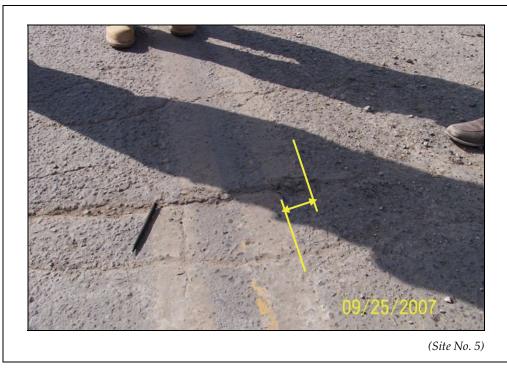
Approach pavement at the south abutment of Huamani Bridge has settled dramatically due to liquefaction of supporting soils and lateral spread of the embankment.
